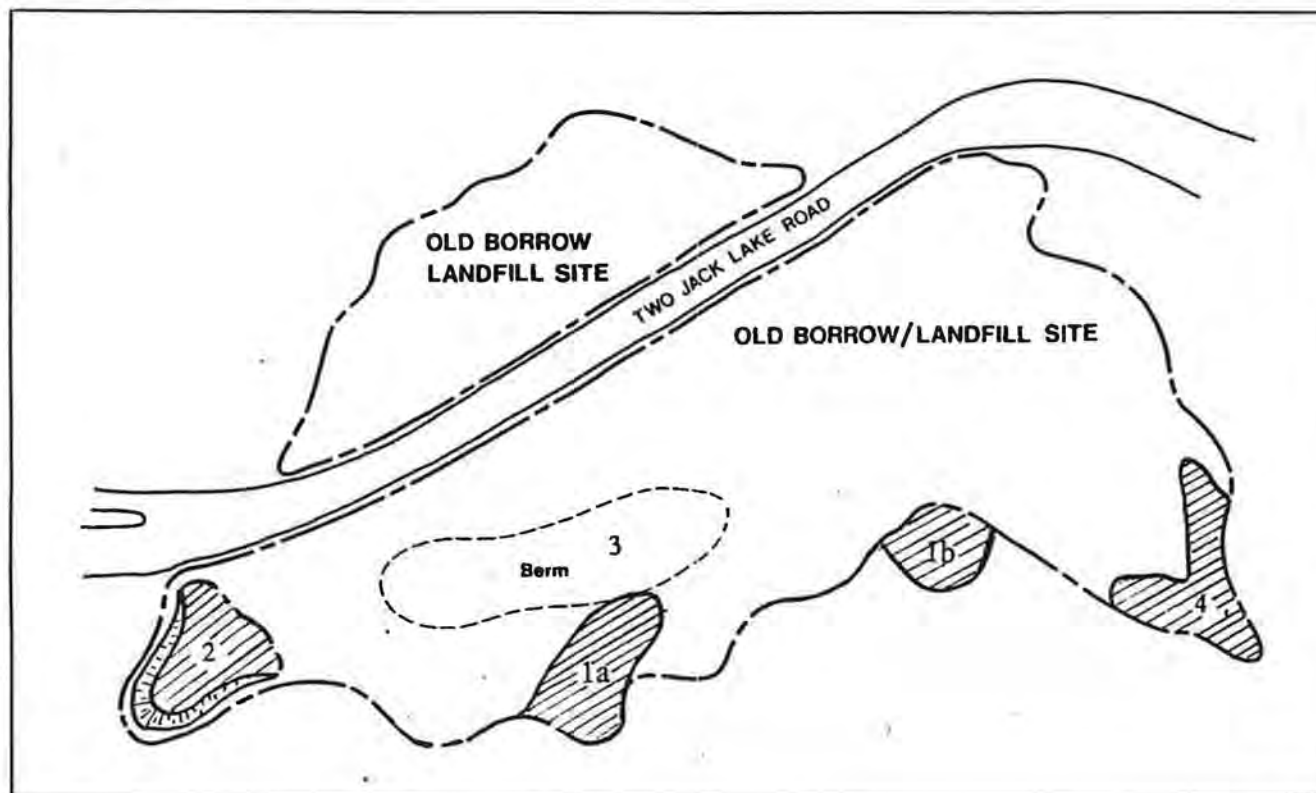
The Cascade Landfill in Banff National Park. (The four types of recontouring that have been completed on the site are shown. Site 1a is the location of the new gully. Site 1b is the second access route for wildlife. Site 2 is the borrow pit that was developed as a bowl-shaped swale. Site 3 is the rise enhanced by dumping excess fill material from 1a over the shallowly-buried garbage layer. Site 4 is the resloped access route at the east end of the site.)
